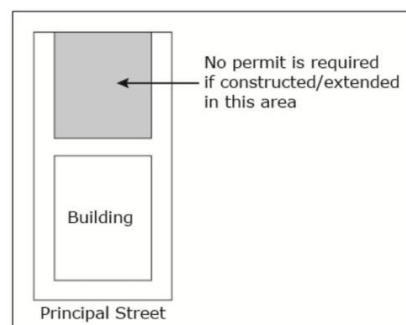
Construction/extension of outbuilding to a contributory property (not located on a corner site).
